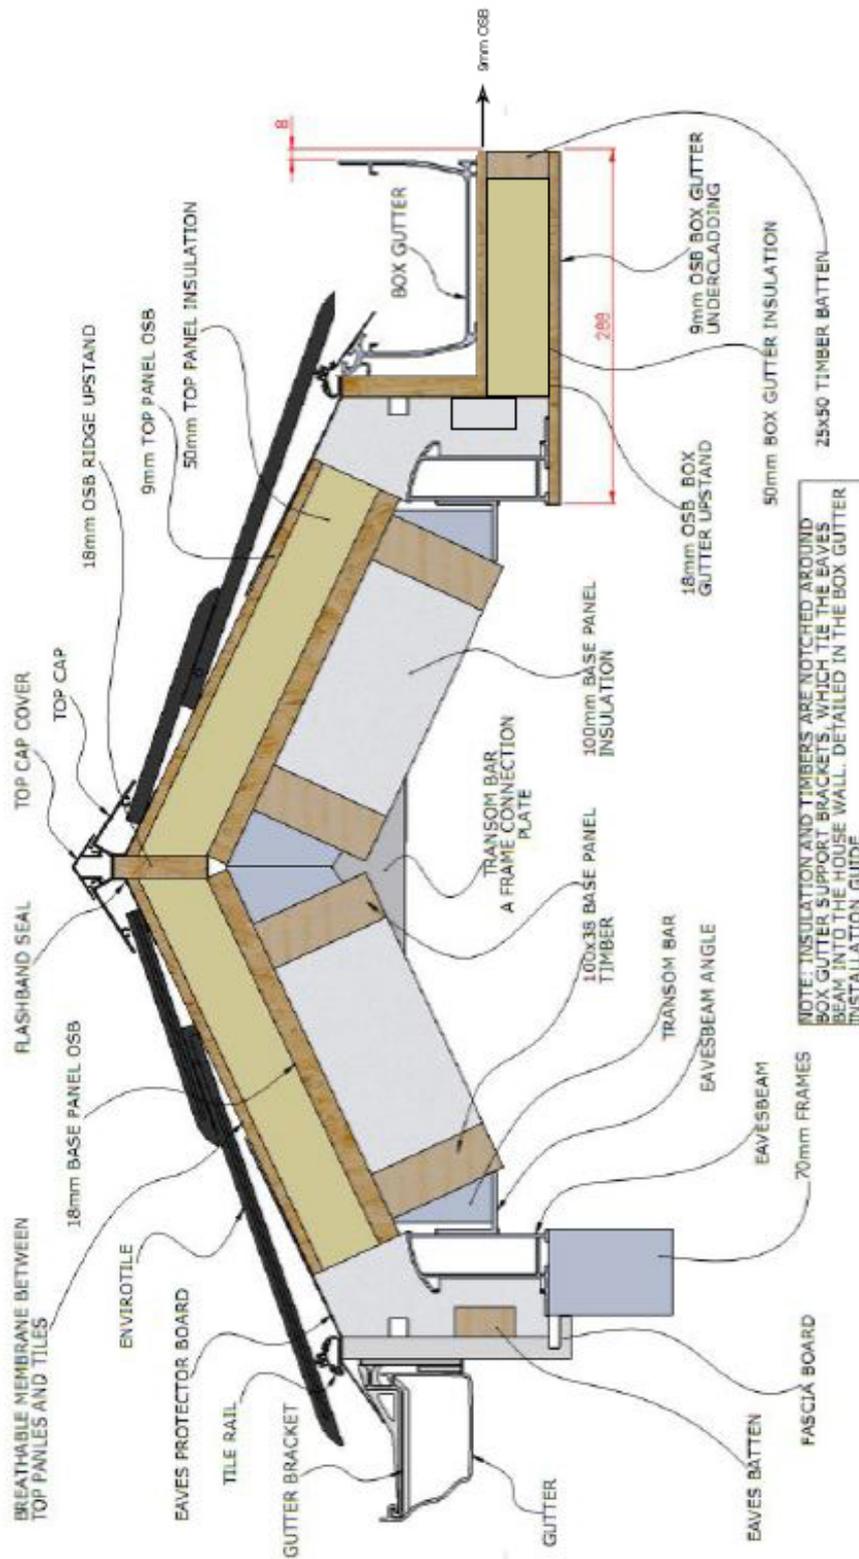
MAIN ASSEMBLY CROSS-SECTION
